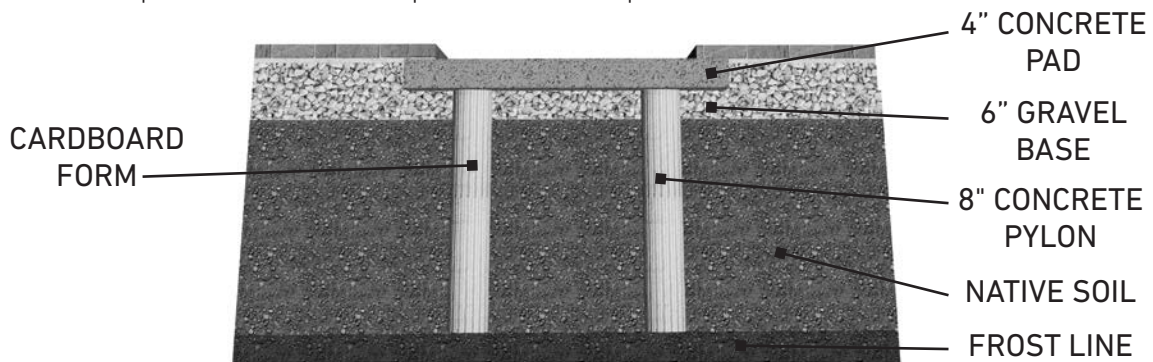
FIGURE B & C - A properly constructed level footing is required to place your bottom unit on. If you are unfamiliar with soil conditions and the process of pouring a concrete footing, please consult a professional masonry contractor. Be sure to follow all local building codes before beginning construction.
